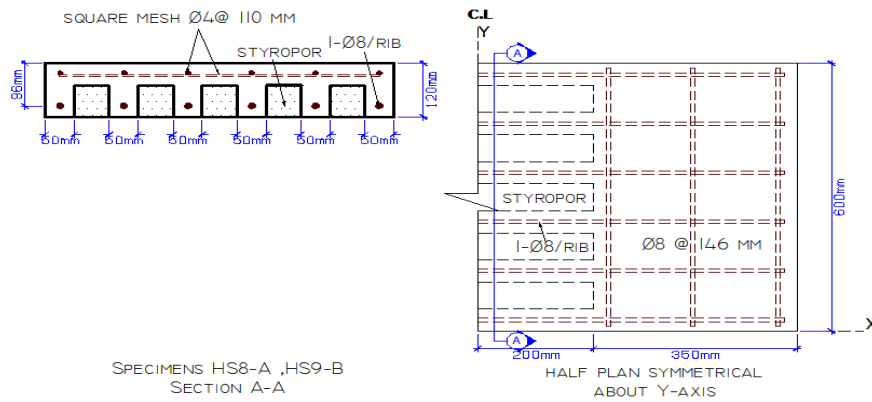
Reinforcement details of specimens HS8-A and HS9-B
